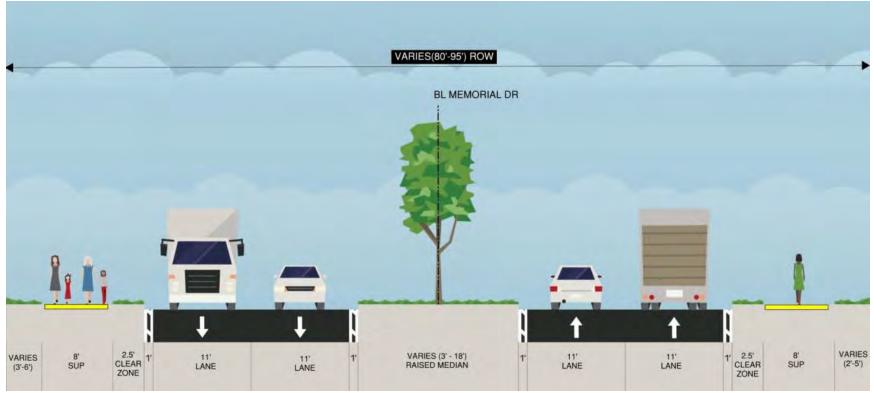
C: Proposed Typical Section – Memorial Drive (Frostwood Drive to North Tealwood Drive)
